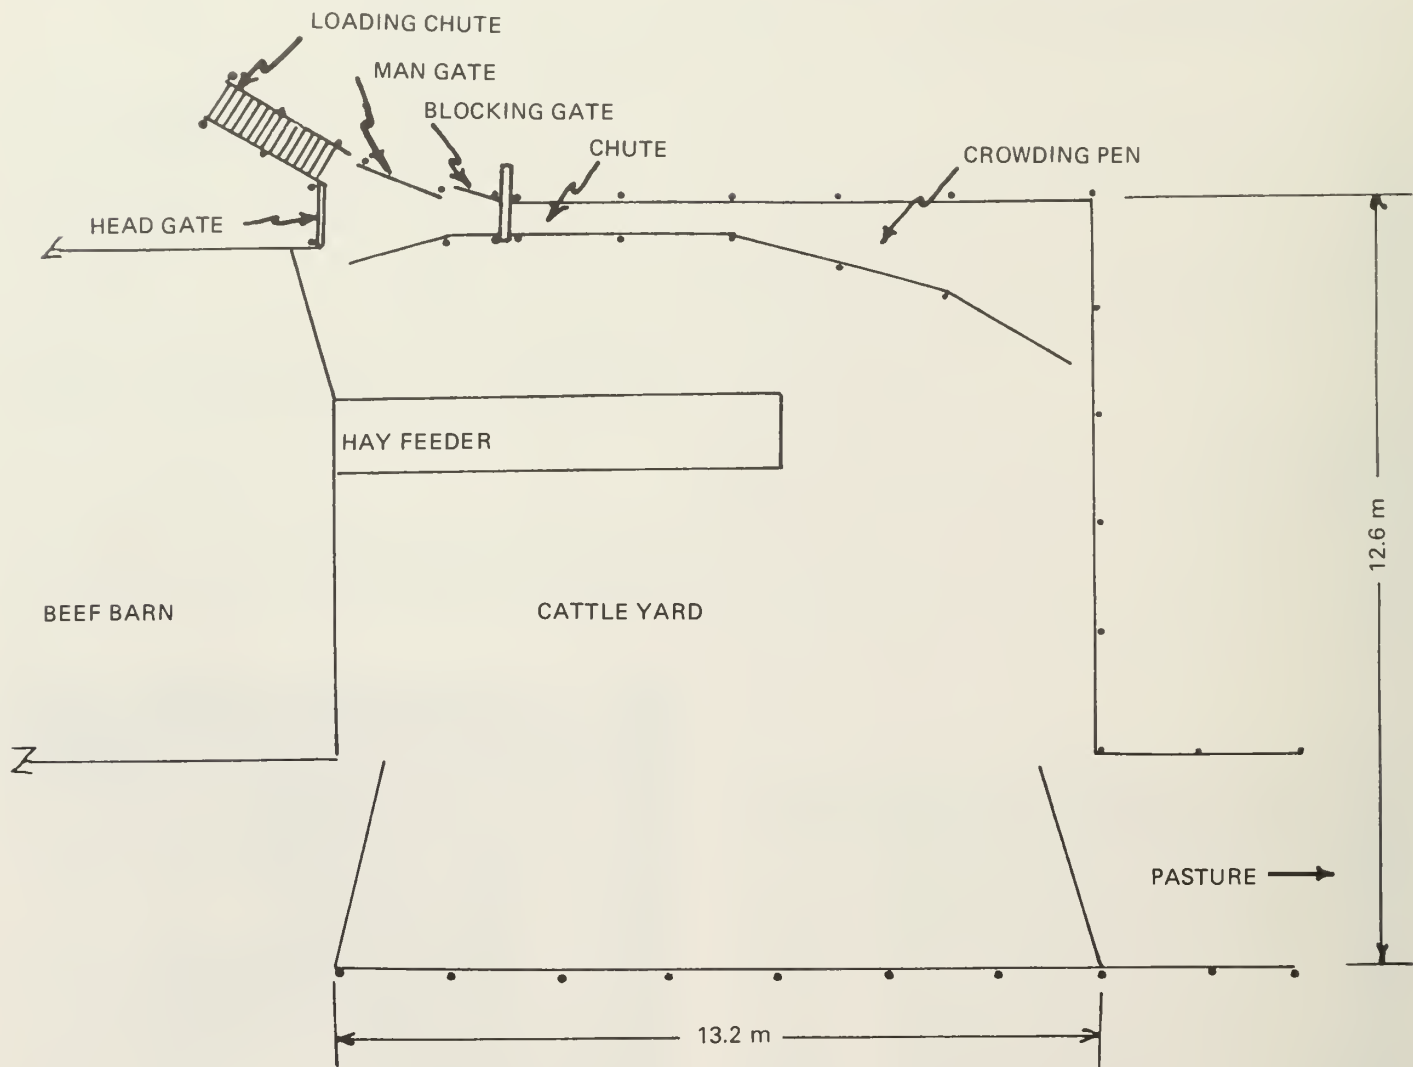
Corral plan for a small beef farm of 50-100 head. See also Canada Plan Service plan M-1831.
